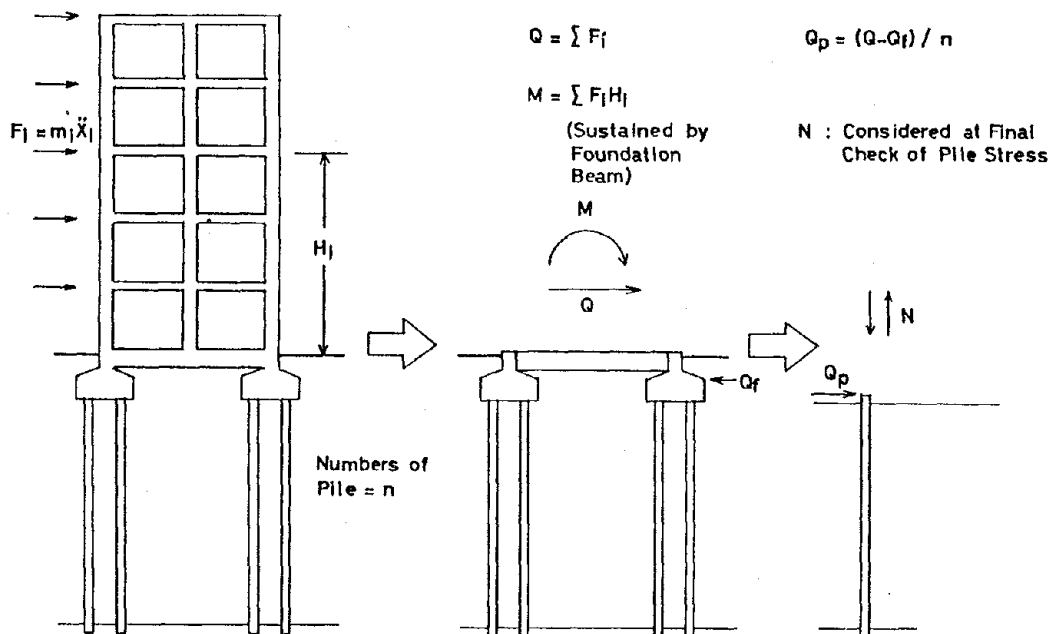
Actual State of Design of Pile Foundation to Horizontal Force
